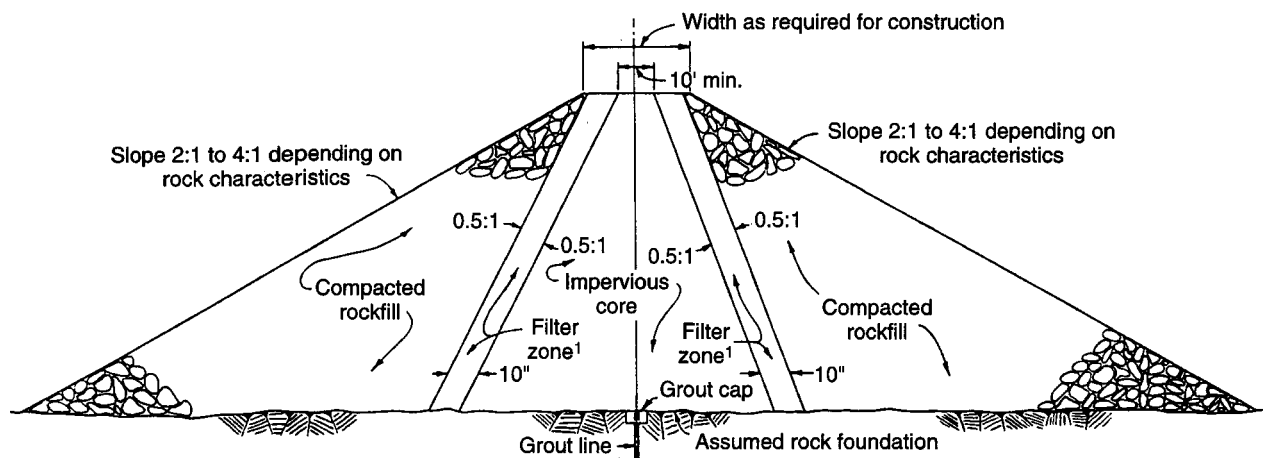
Typical maximum section of an earth-core rockfill dam using a central core (from U.S. Bureau of Reclamation (1987)).
